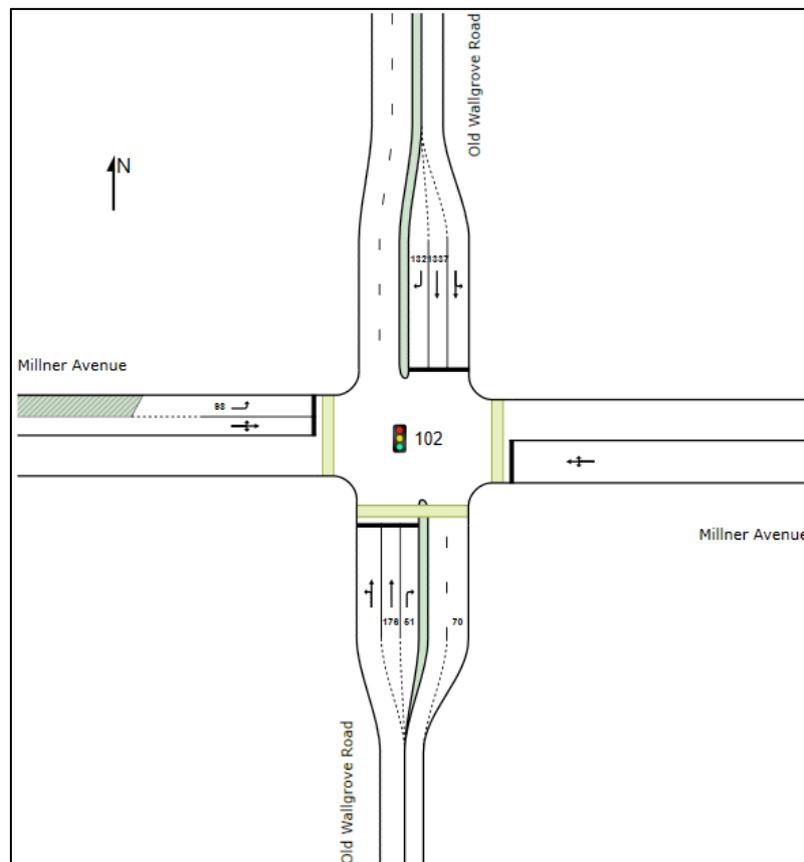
SIDRA Existing Intersection Layout – Millner Ave / Old Wallgrove Rd
